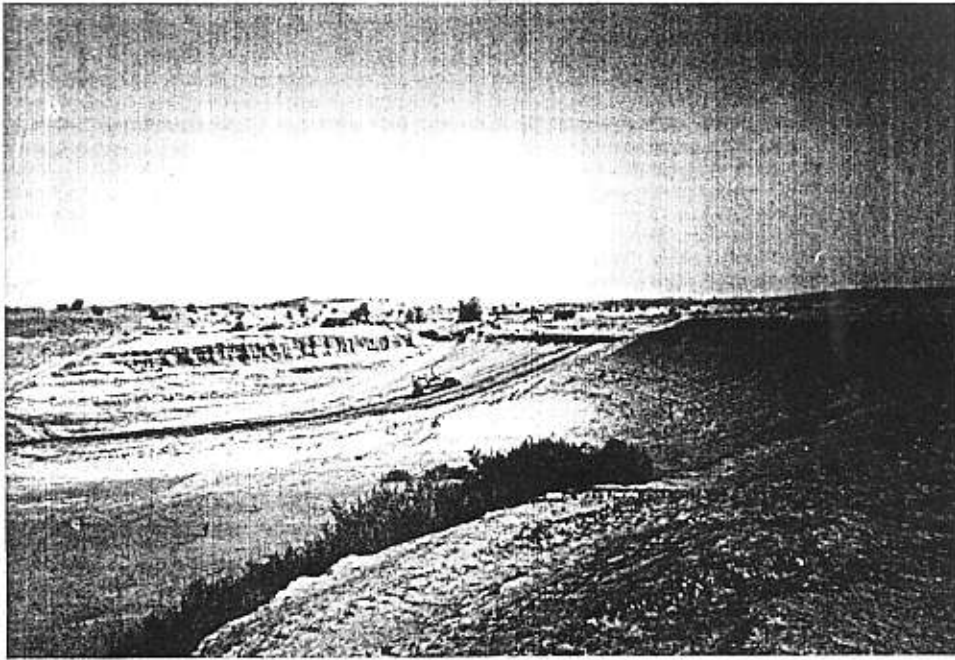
CONSTRUCTION OF JAMAK BUND
